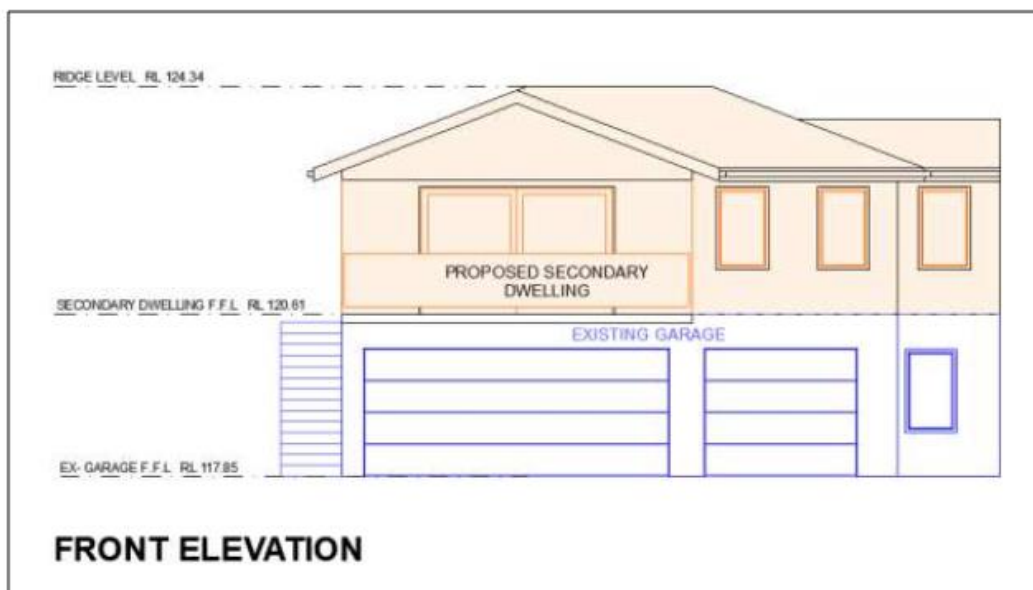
Proposed Elevation fronting rear lane, Stipa Lane
